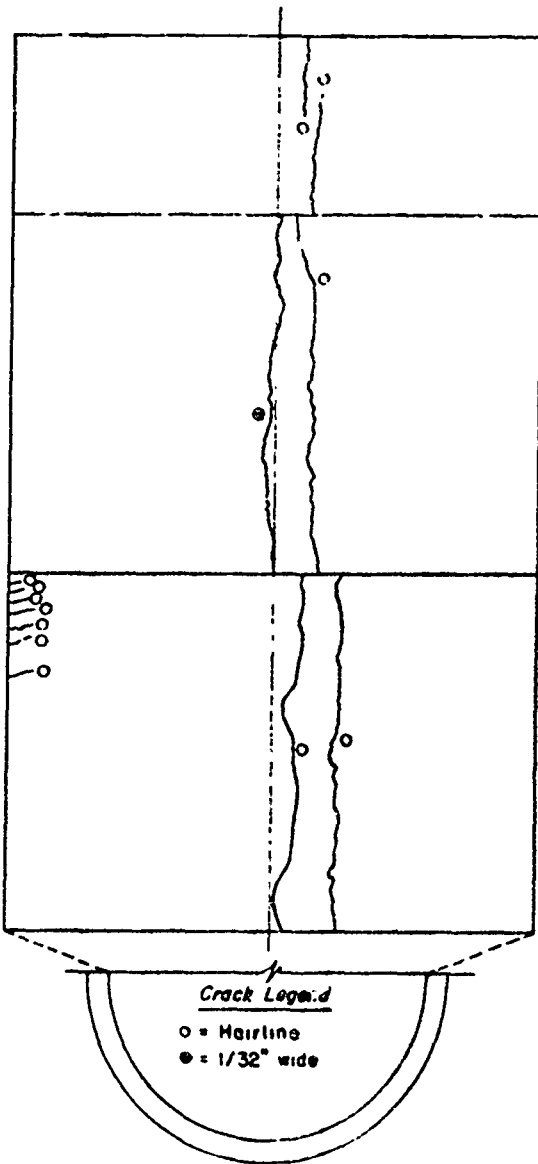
Crack survey of bottom half, developed; concrete Conduit 3.21.
